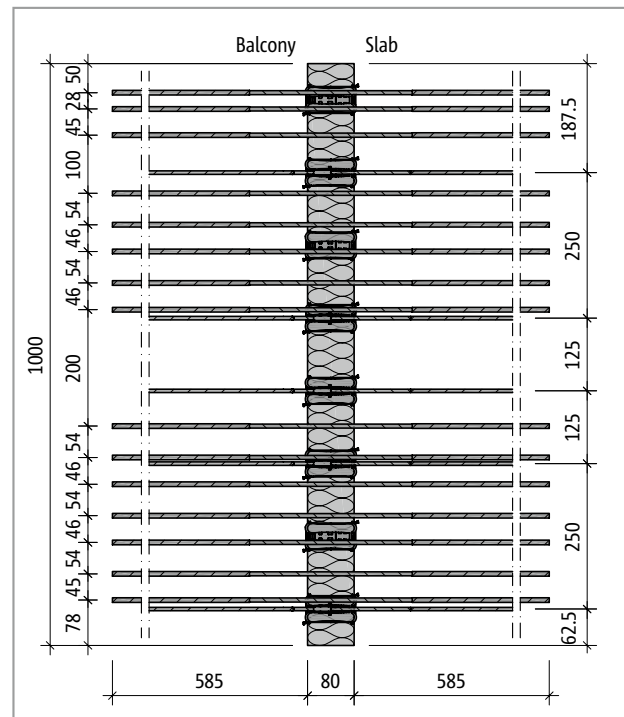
Schöck Isokorb® T type K-M6-V1: Product layout
